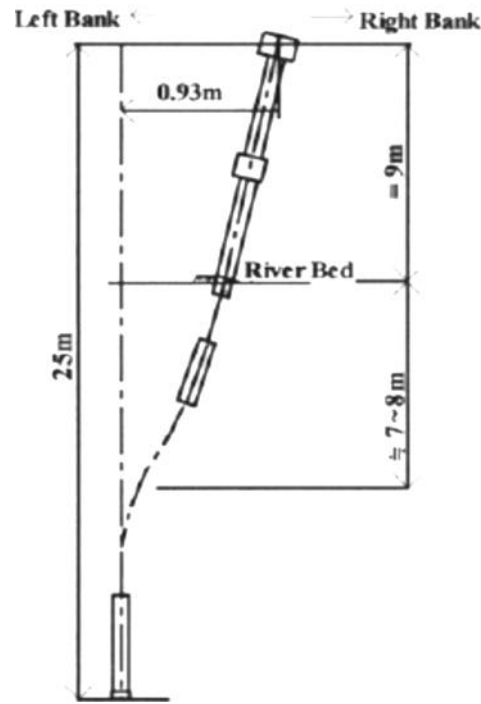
Deflection of steel pile under the pier P-4 of Showa Bridge (Hamada et al., 1986).
